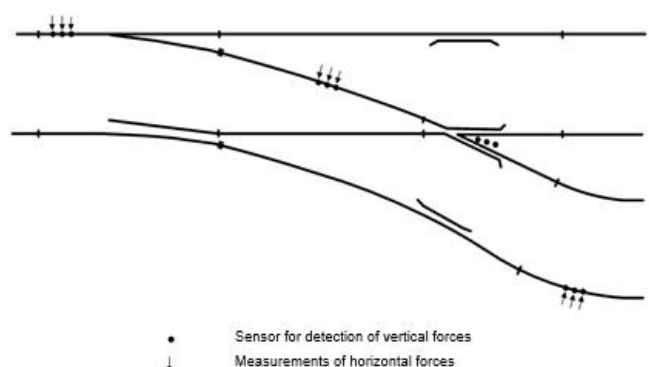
Layout of force meters on railroad switch, type R65, model 1/11.
